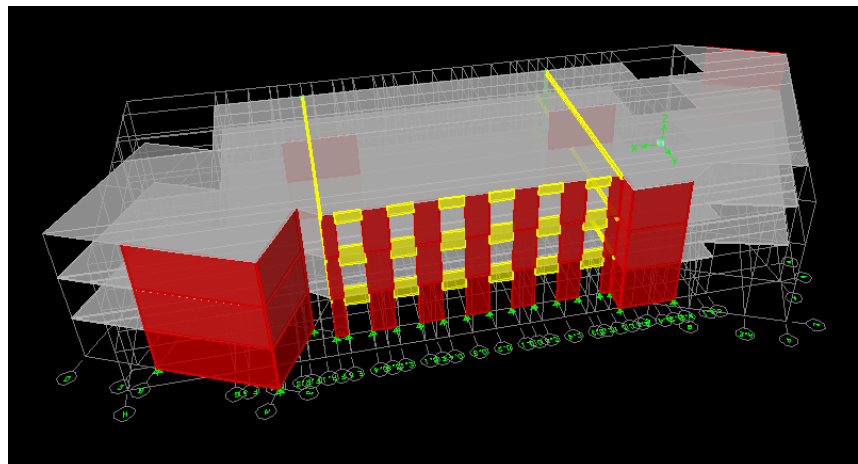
Sample ETABS Model Showing Walls and Coupling Beams
